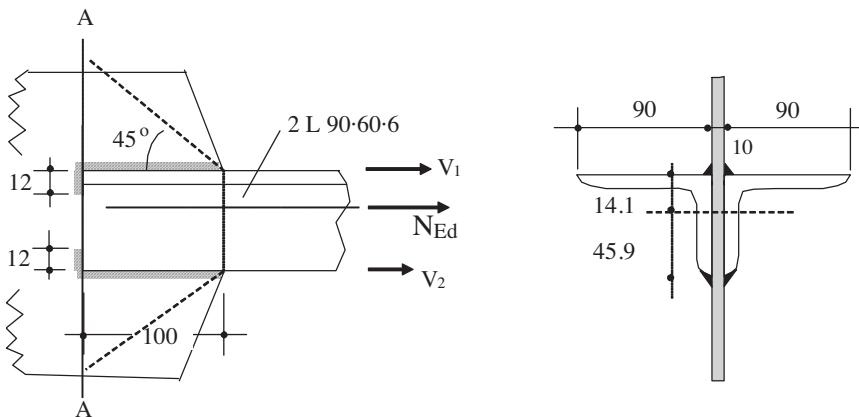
Welded connection of two angles with a gusset plate
